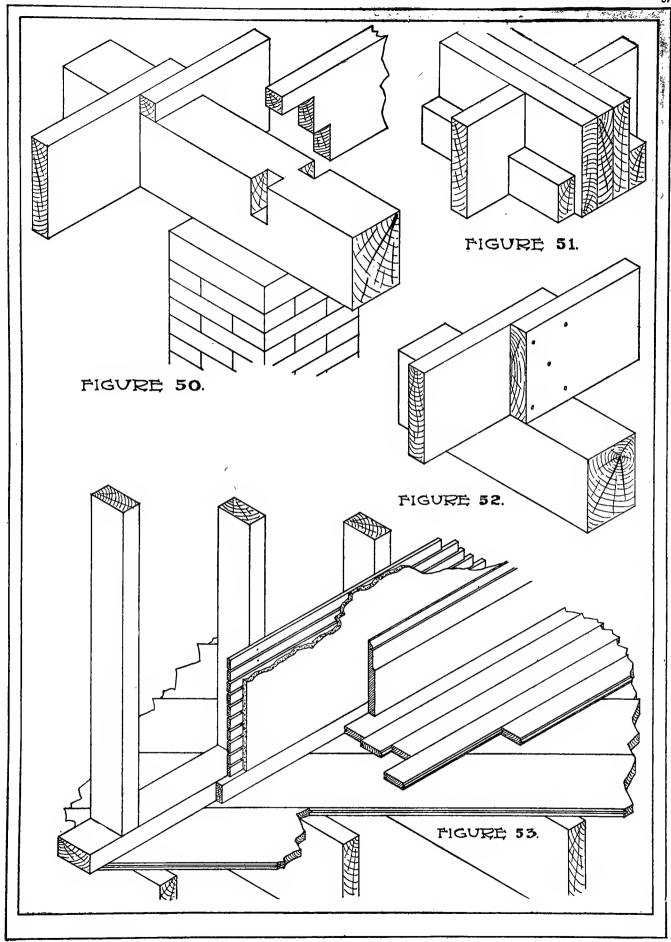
FLOOR CONSTRUCTION AND SUPPORT
